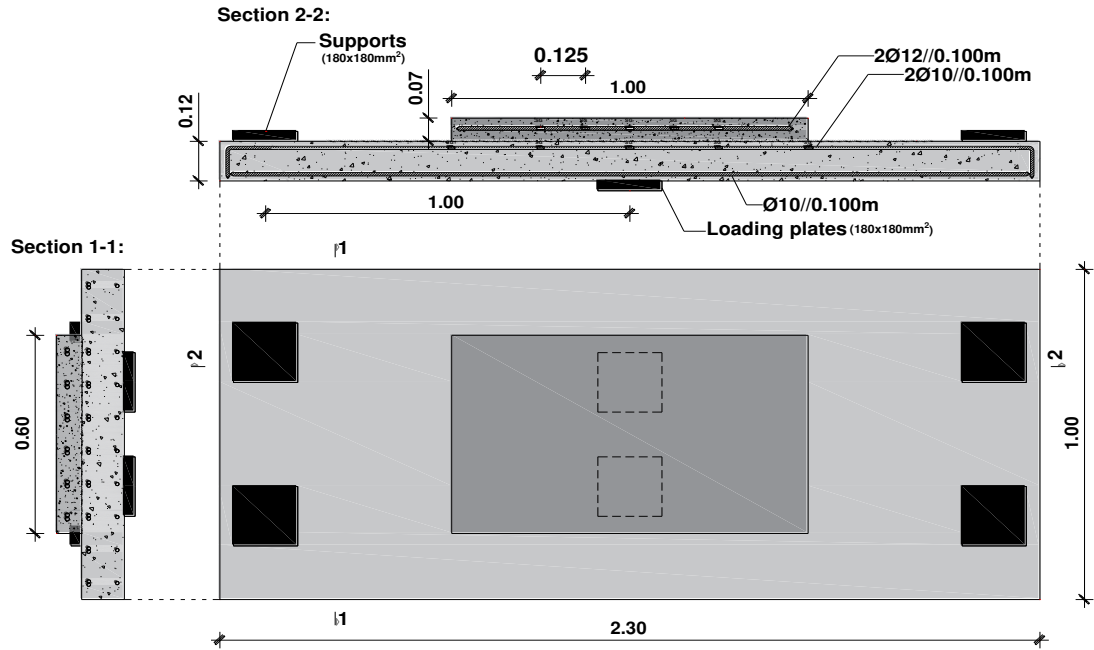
Rebar detailing and strain gauge placing for reference specimens (Rs-REF).
